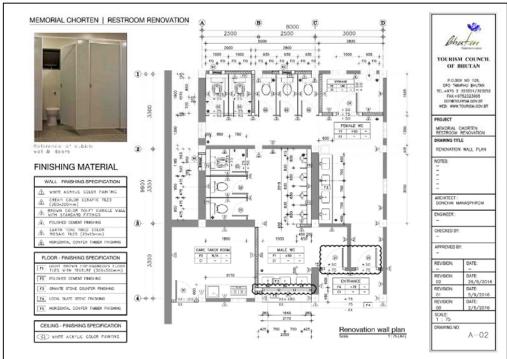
,02. Renovation drawings of Memorial Chorten existing restrooms
